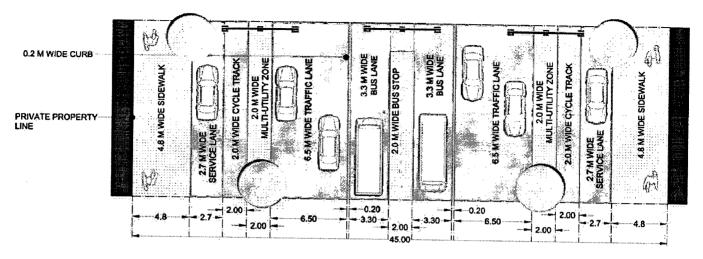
Detail for 45m wide Street (alternate 2)
